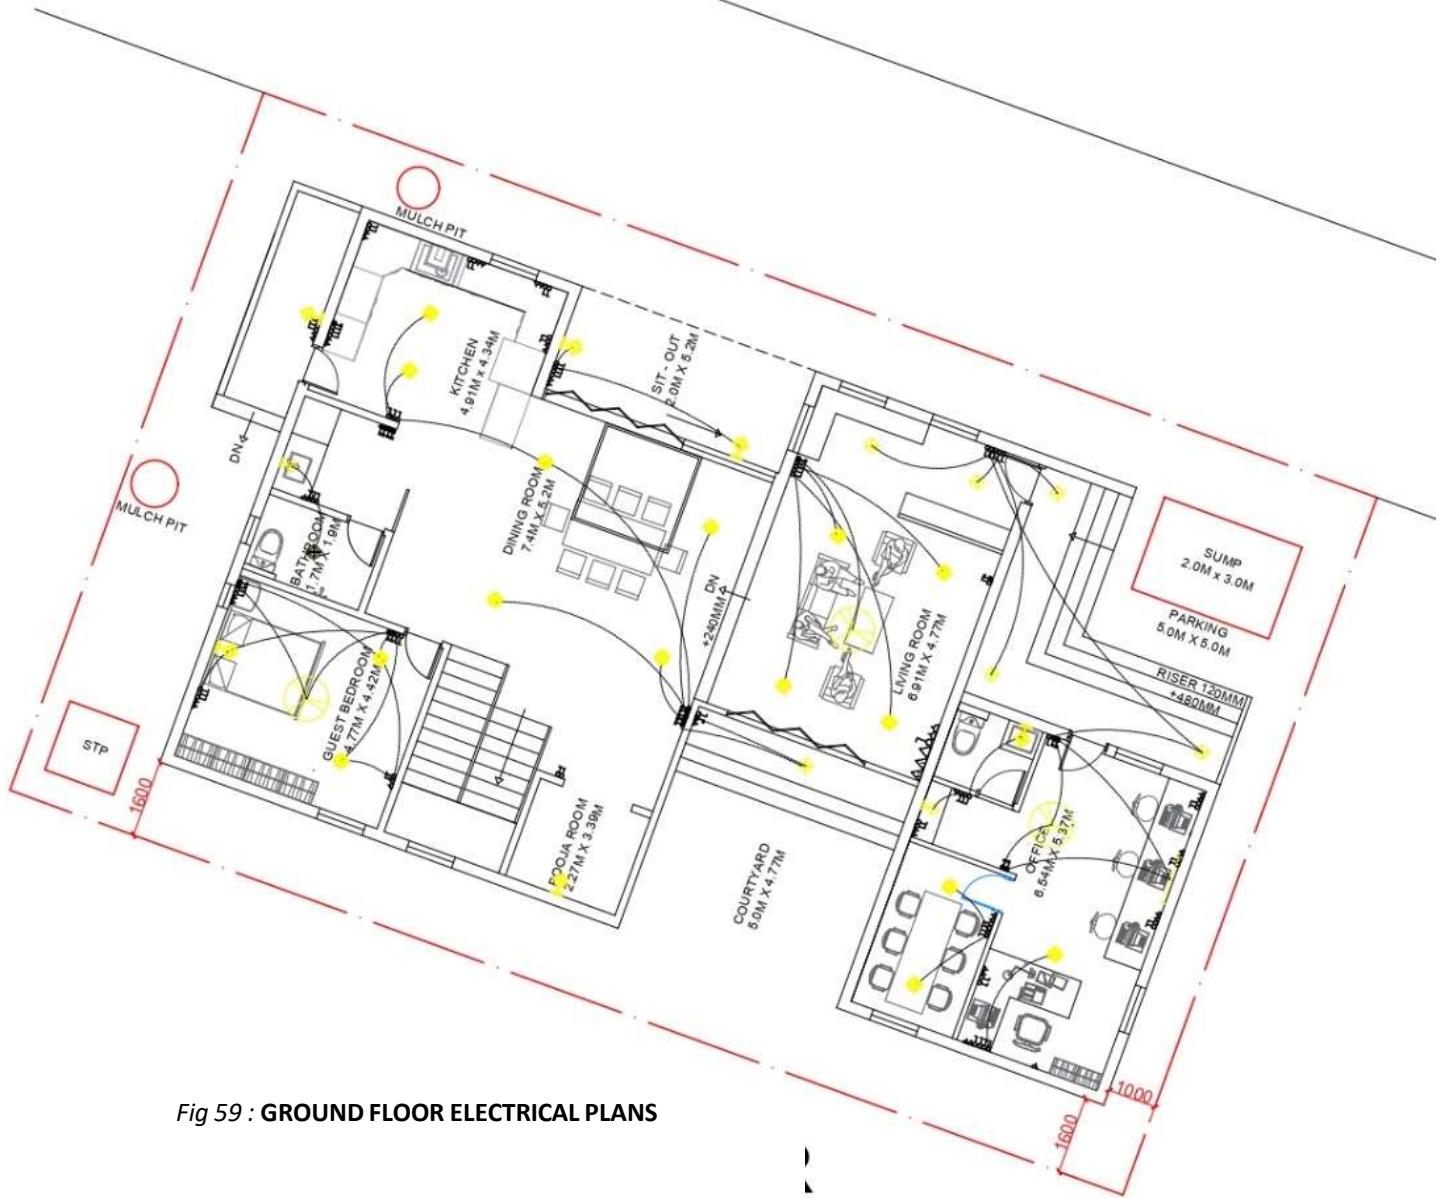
GROUND FLOOR ELECTRICAL PLANS
